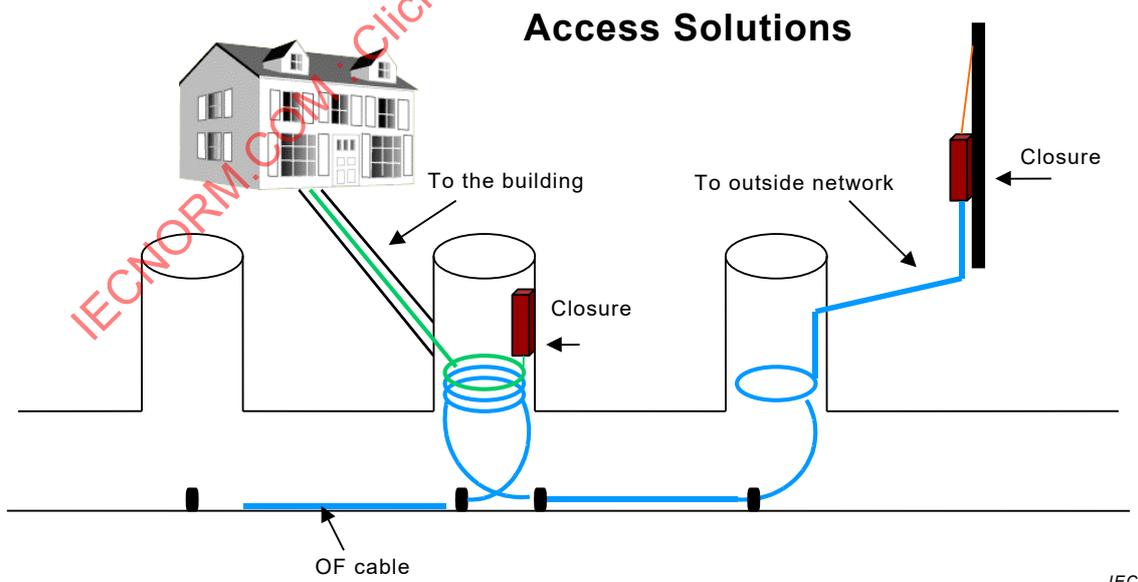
Schematic drawing – Laying on the ground of optical fibre cables within sewers
